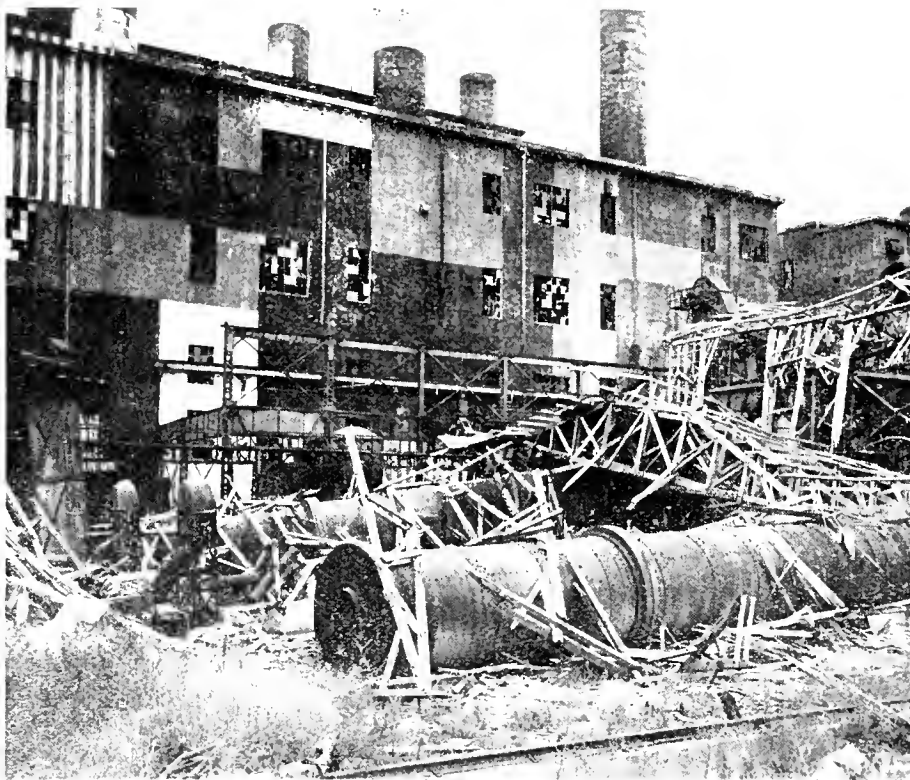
Damaged coal driers and general debris. Note camouflage paint on building. Raid number 2
